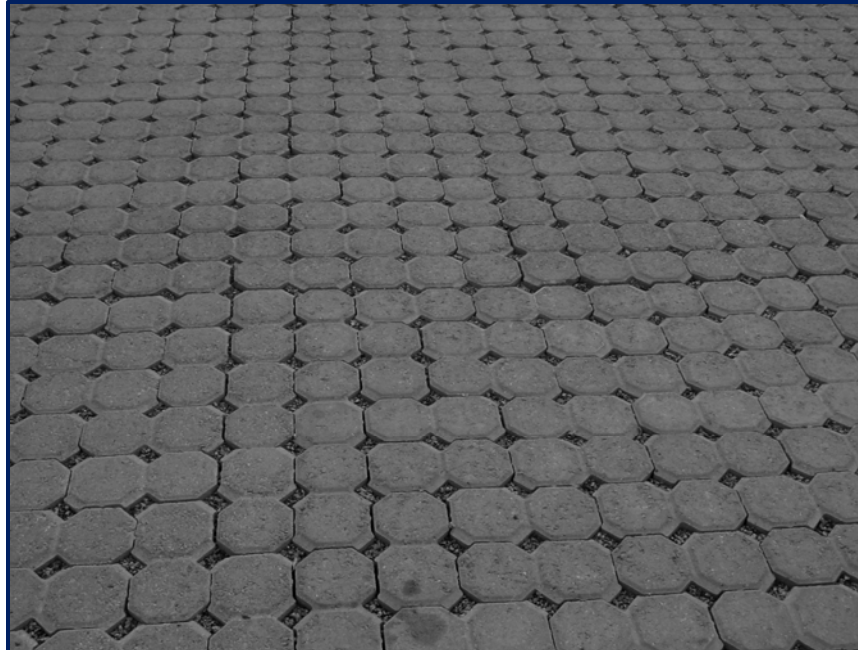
Concrete paver blocks make aesthetically pleasing, well drained pavements for low-volume streets, parking lots, etc.
